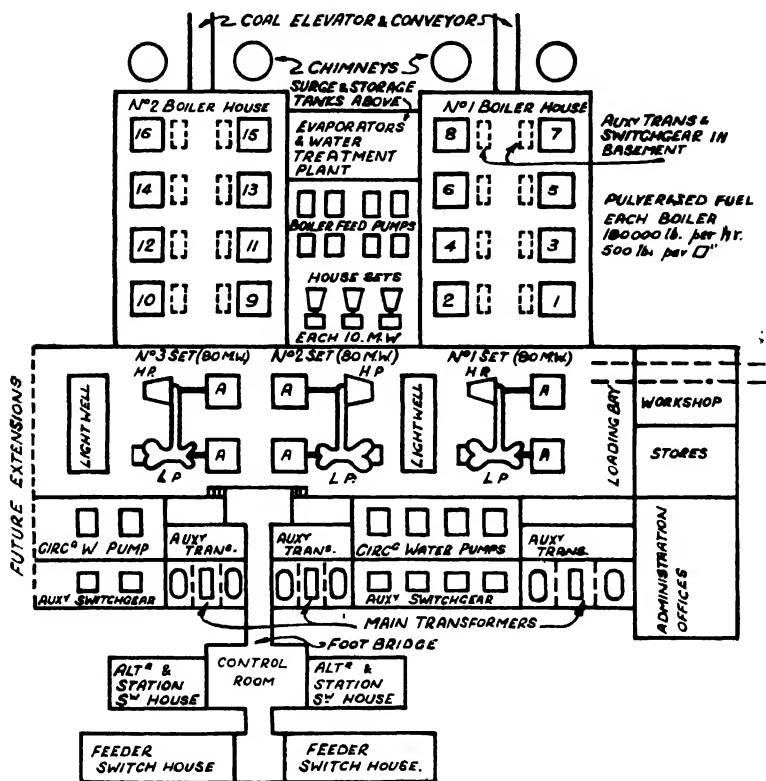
Layout of Plant and Buildings for 350 MW Station.
